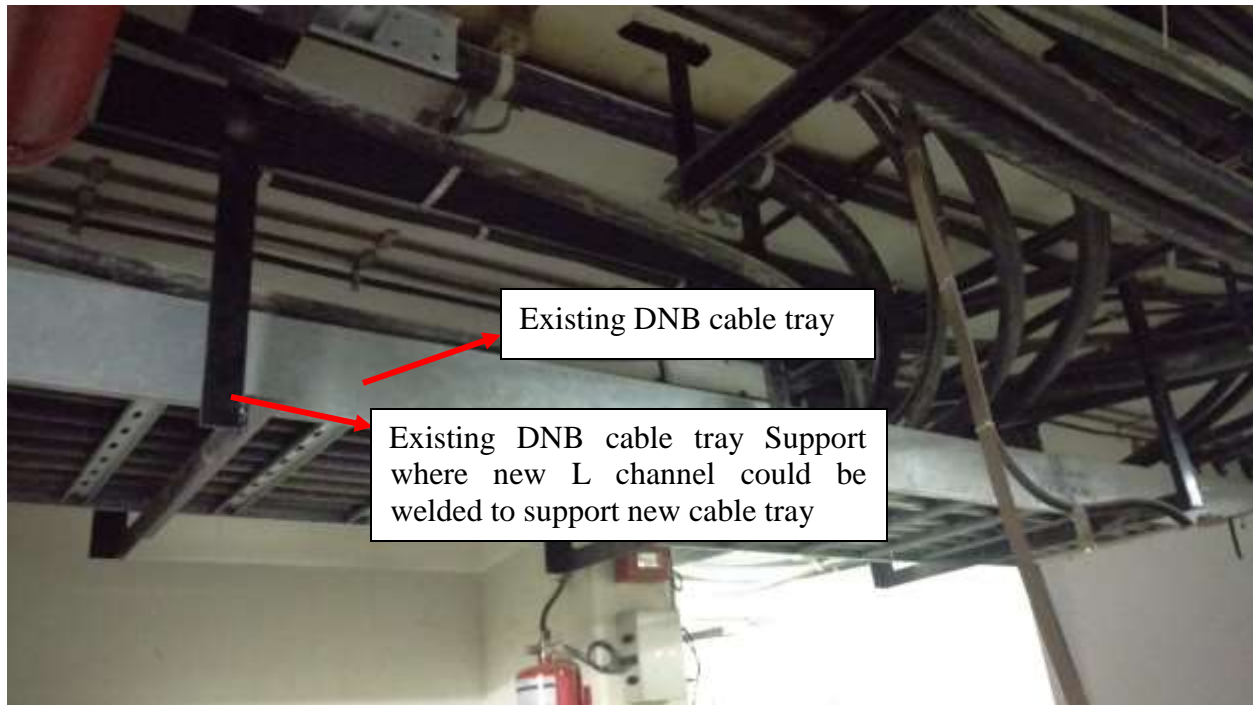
Existing DNB cable tray inside cable area ITER India Building
